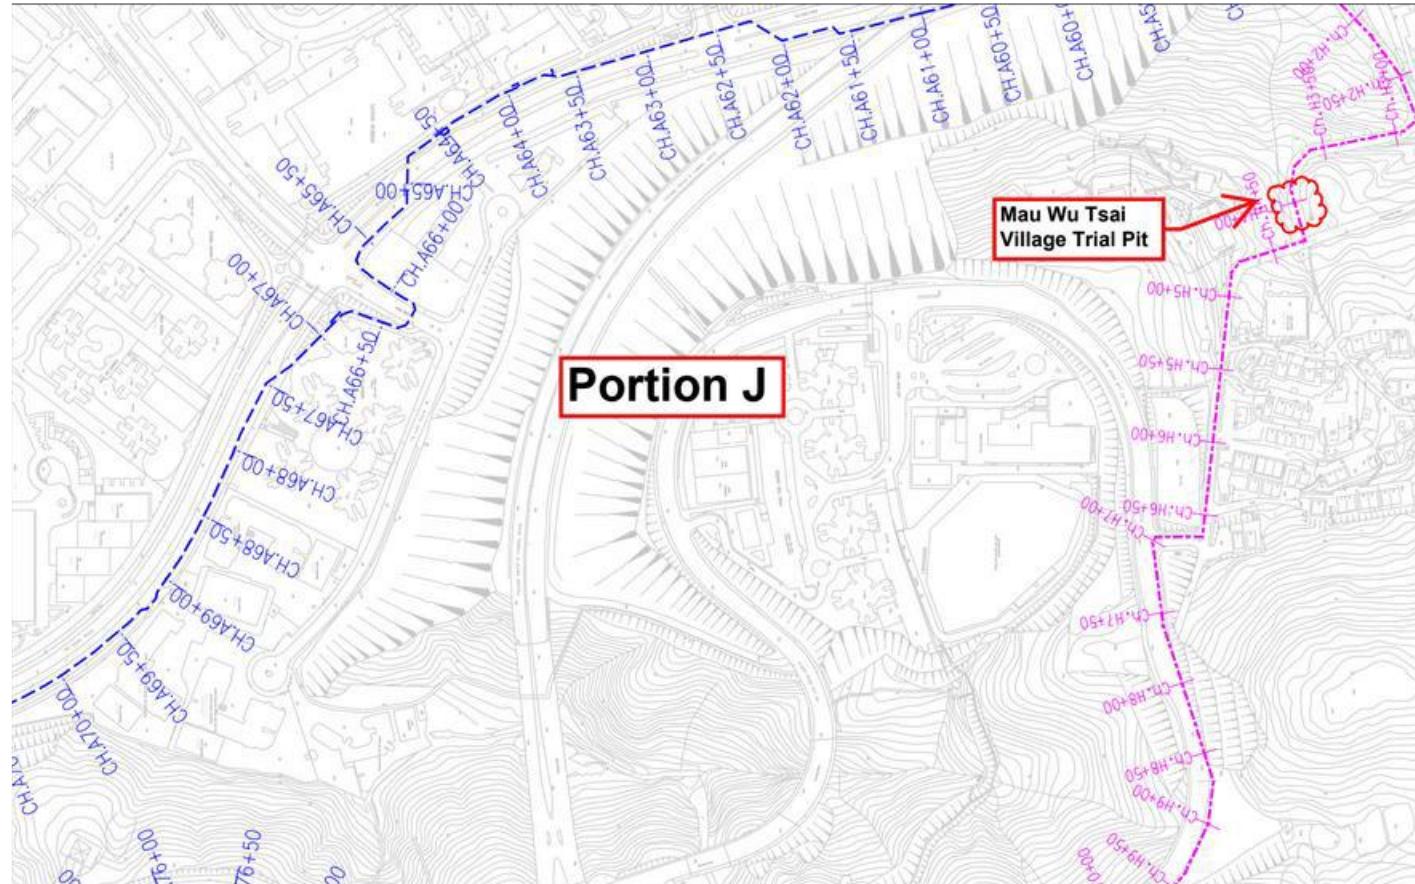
Location Plan for Portion J - Mau Wu Tsai 2 (Po Lam South Road 2)
